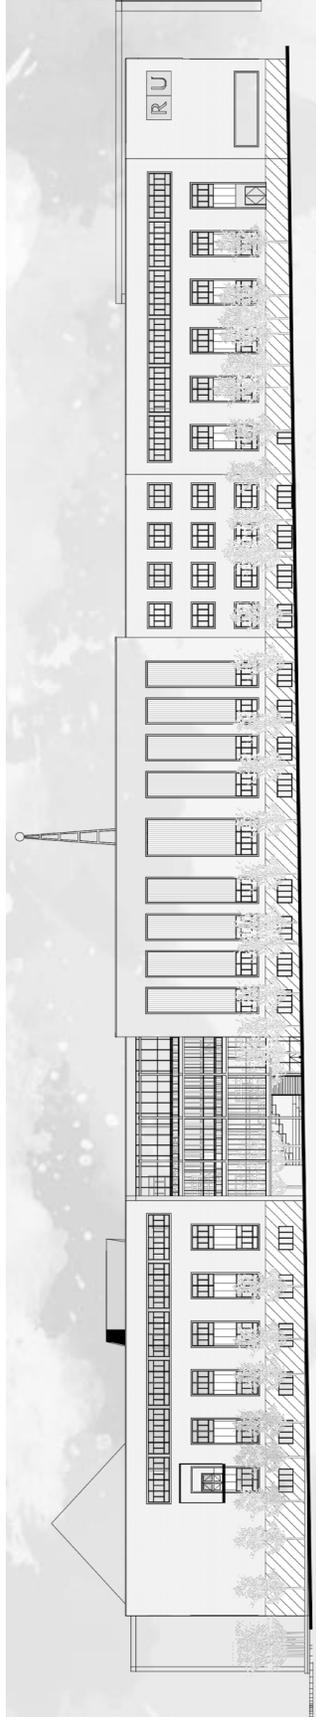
Kerr Hall East Exterior Elevation from Church Street
